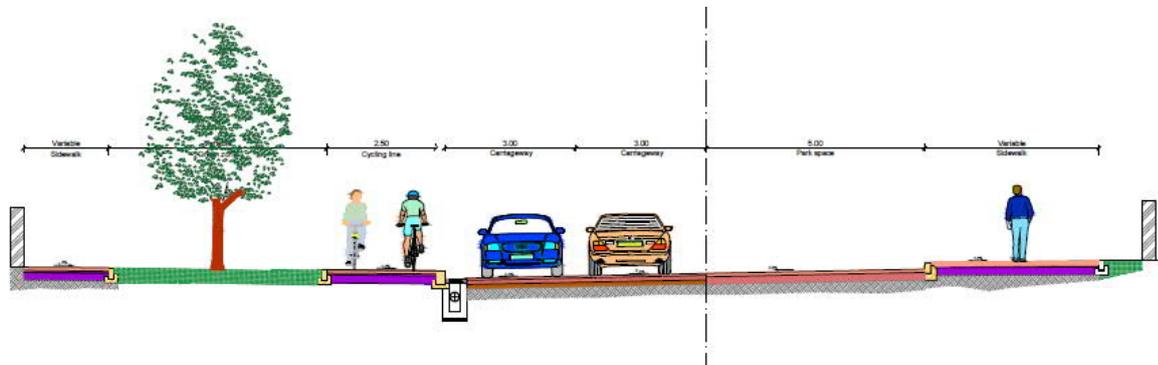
Typical section – Forte de San Sebastián, Sao Tomé
